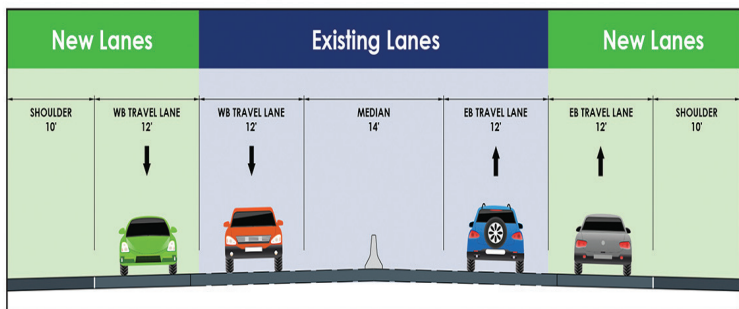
Concept 2 Typical Section St. Martin River and Assawoman Bay Bridges
